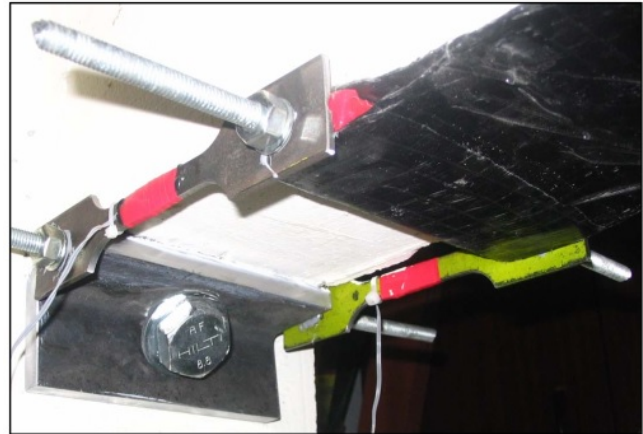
Ductile Anchor used in F-M-U & F-M-B (Galal and Mofidi, 2009)
